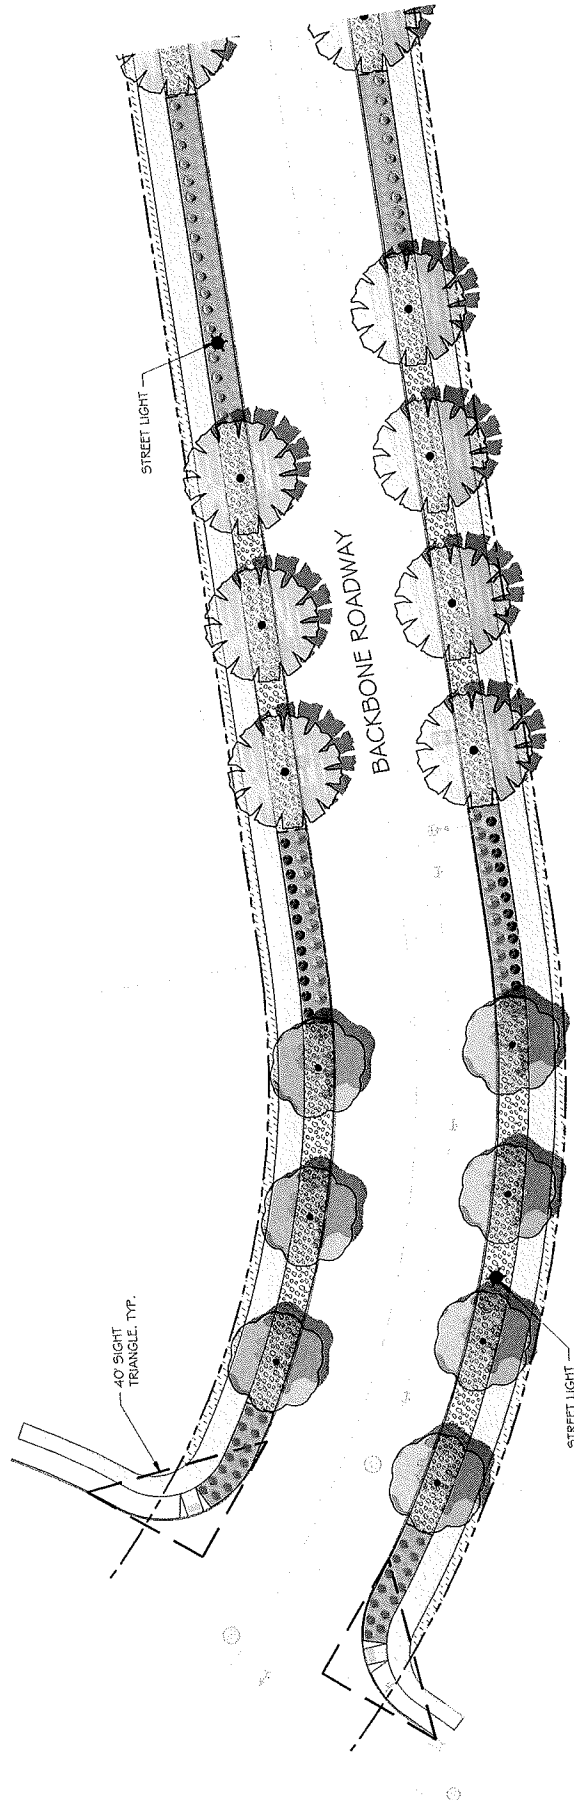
EXHIBIT: TYPICAL LANDSCAPE FOR BACKBONE ROADWAYS
